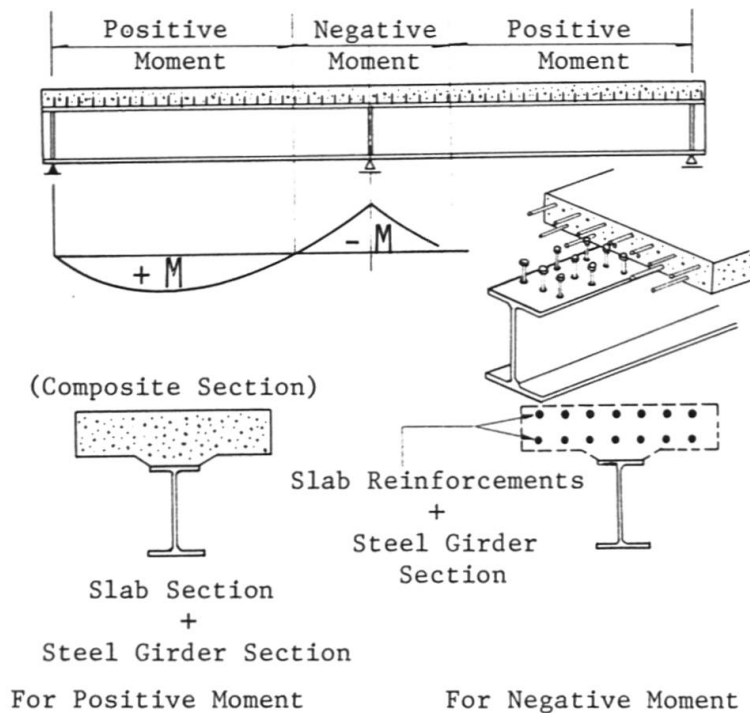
Design Model of Non-Prestressed Continuous Composite Girder
